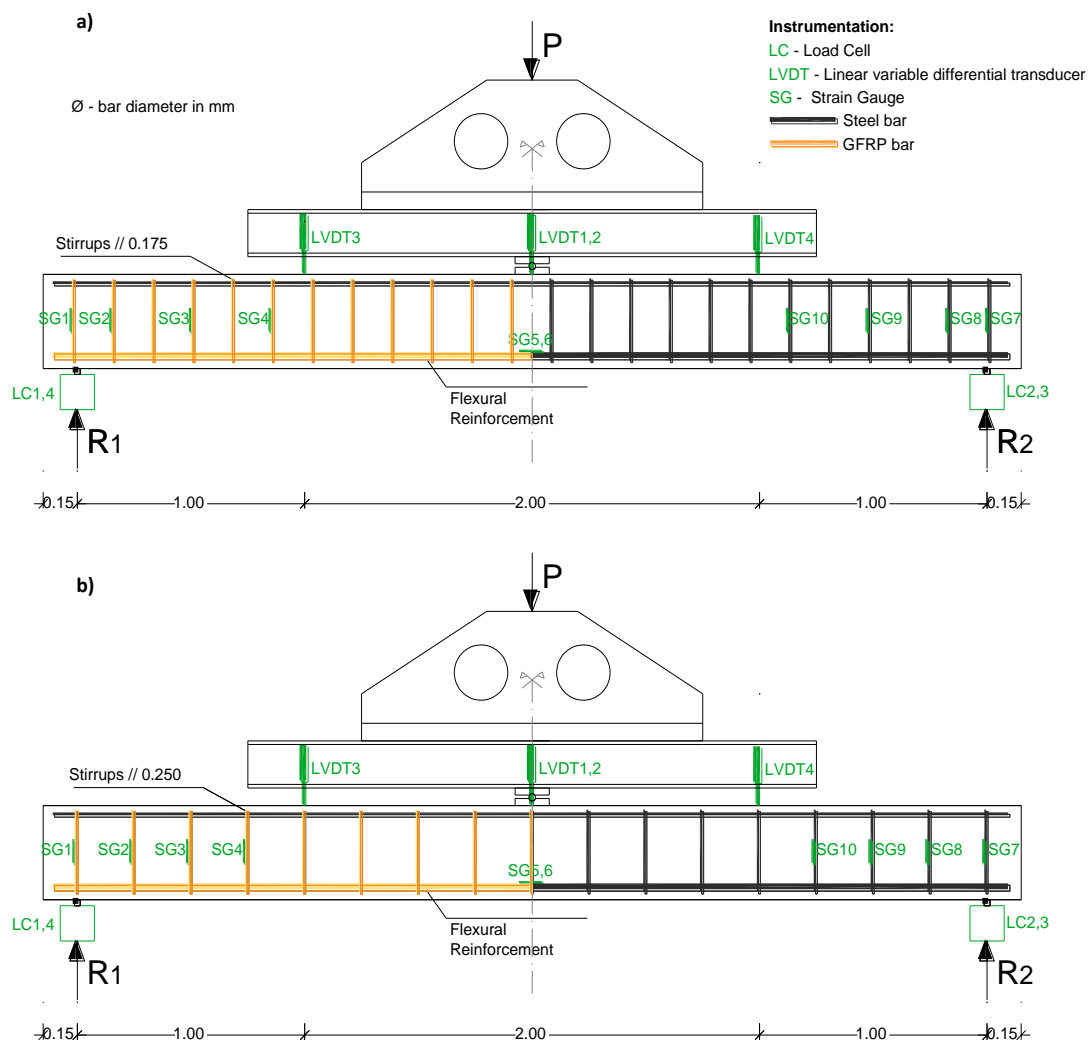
Tests set-up and instrumentation scheme: a) Beam specimens with stirrups spaced at 0.175 m; b) beam specimens with stirrups spaced at 0.250 m
